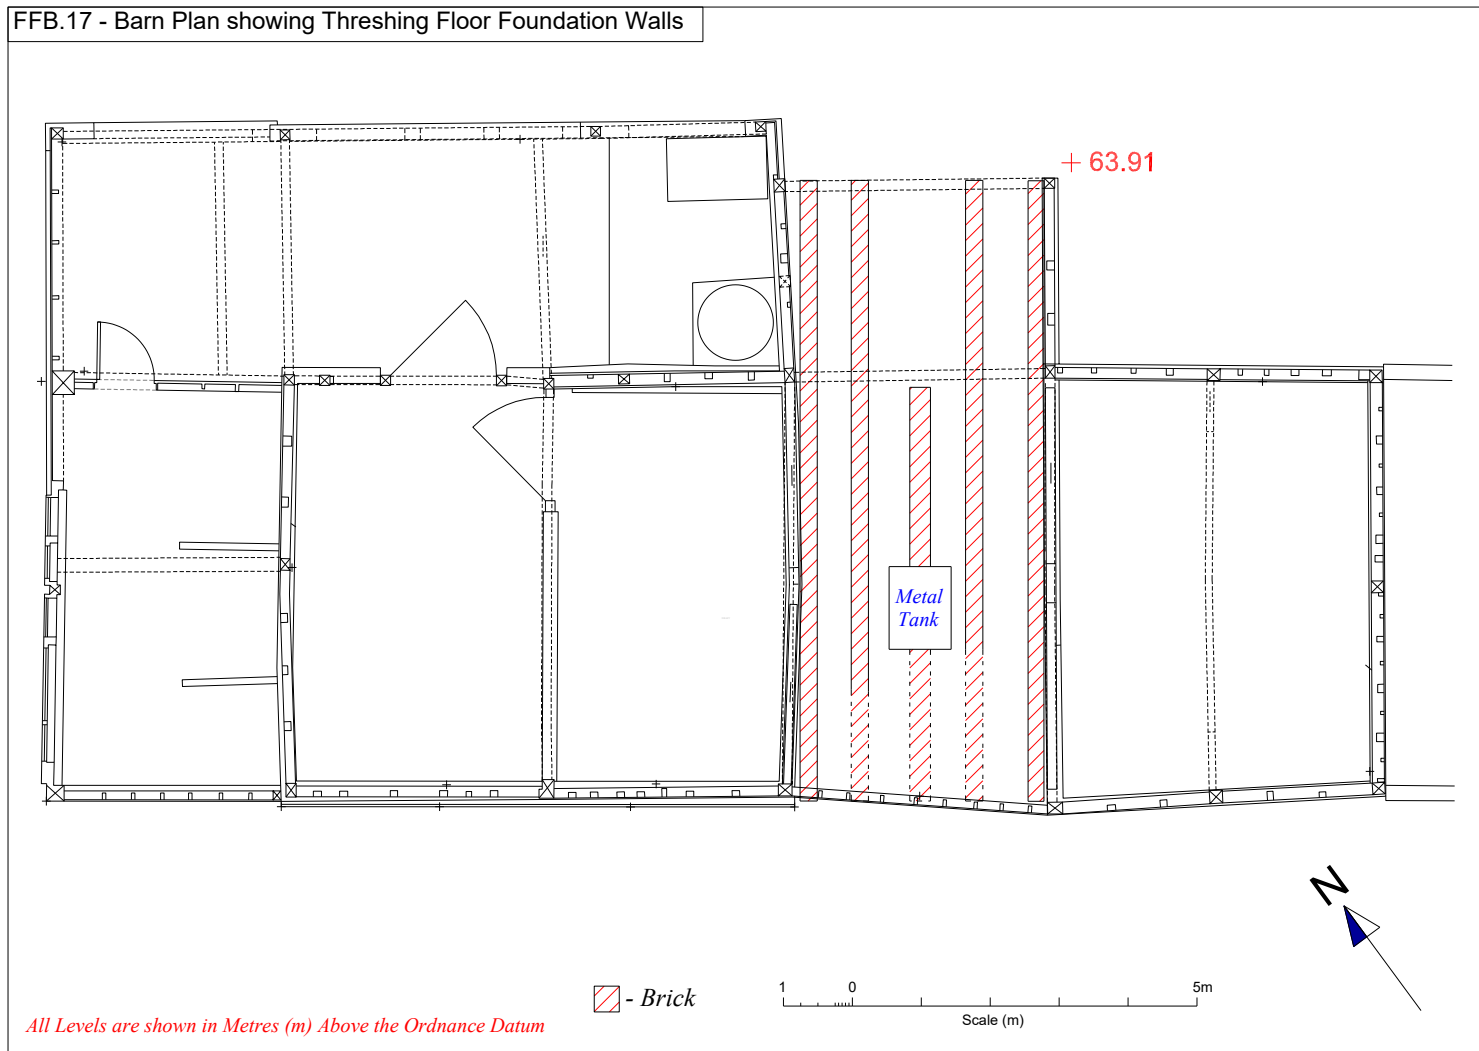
Plan of the Barn showing the position of the sleeper walls for the original threshing floor
